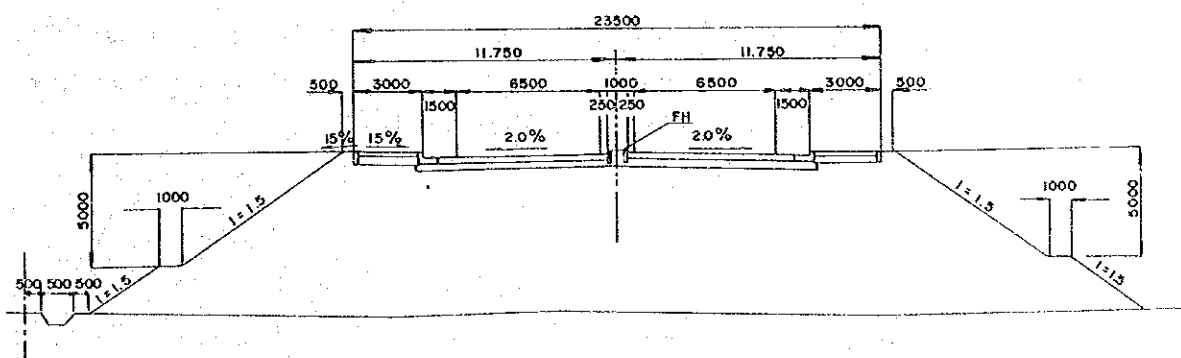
RIVERSIDE BYPASS TYPICAL CROSS SECTION
